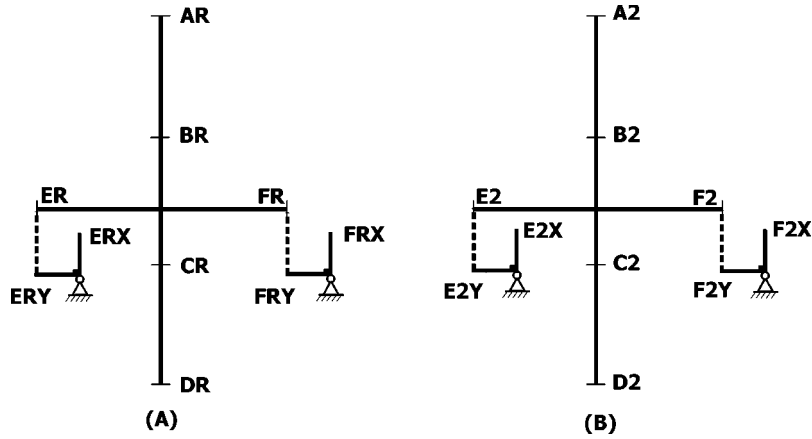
Modeling horizontal diaphragms with compatibility angles: (a) roof diaphragm, and (b) second floor diaphragm.
